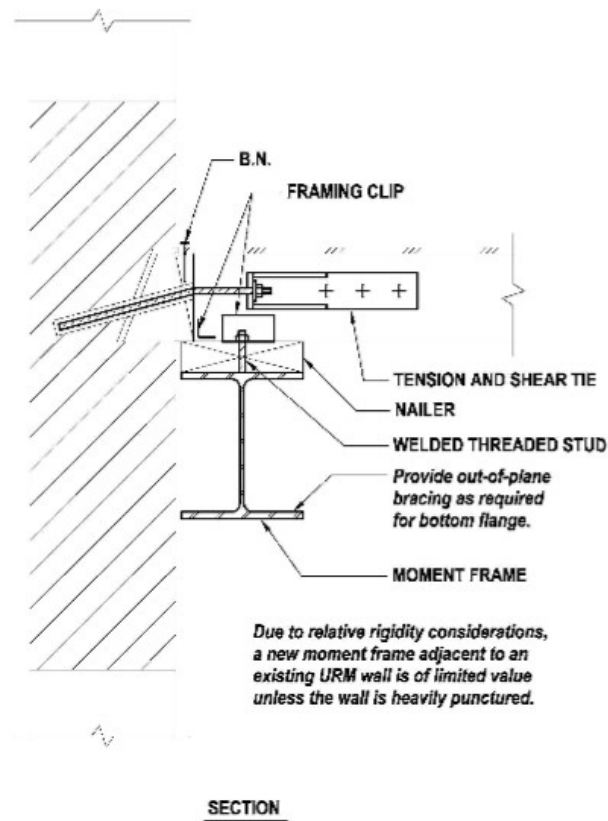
New Perimeter Steel Moment Frame to an Existing Wood Floor
